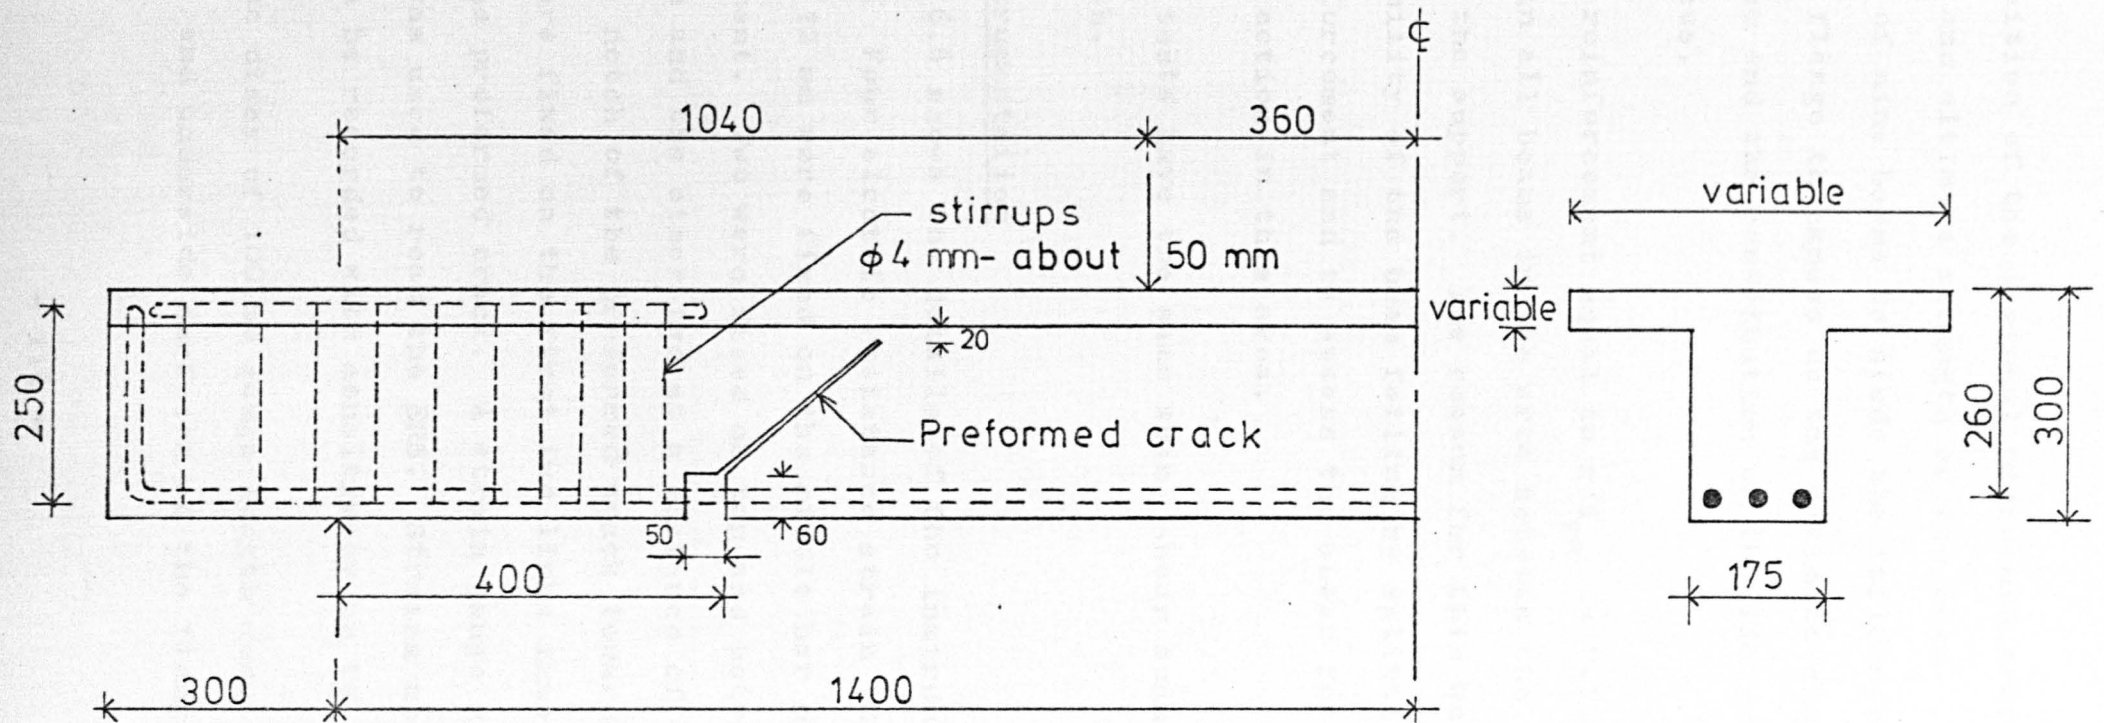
LONGITUDINAL AND CROSS SECTIONS OF BEAMS
